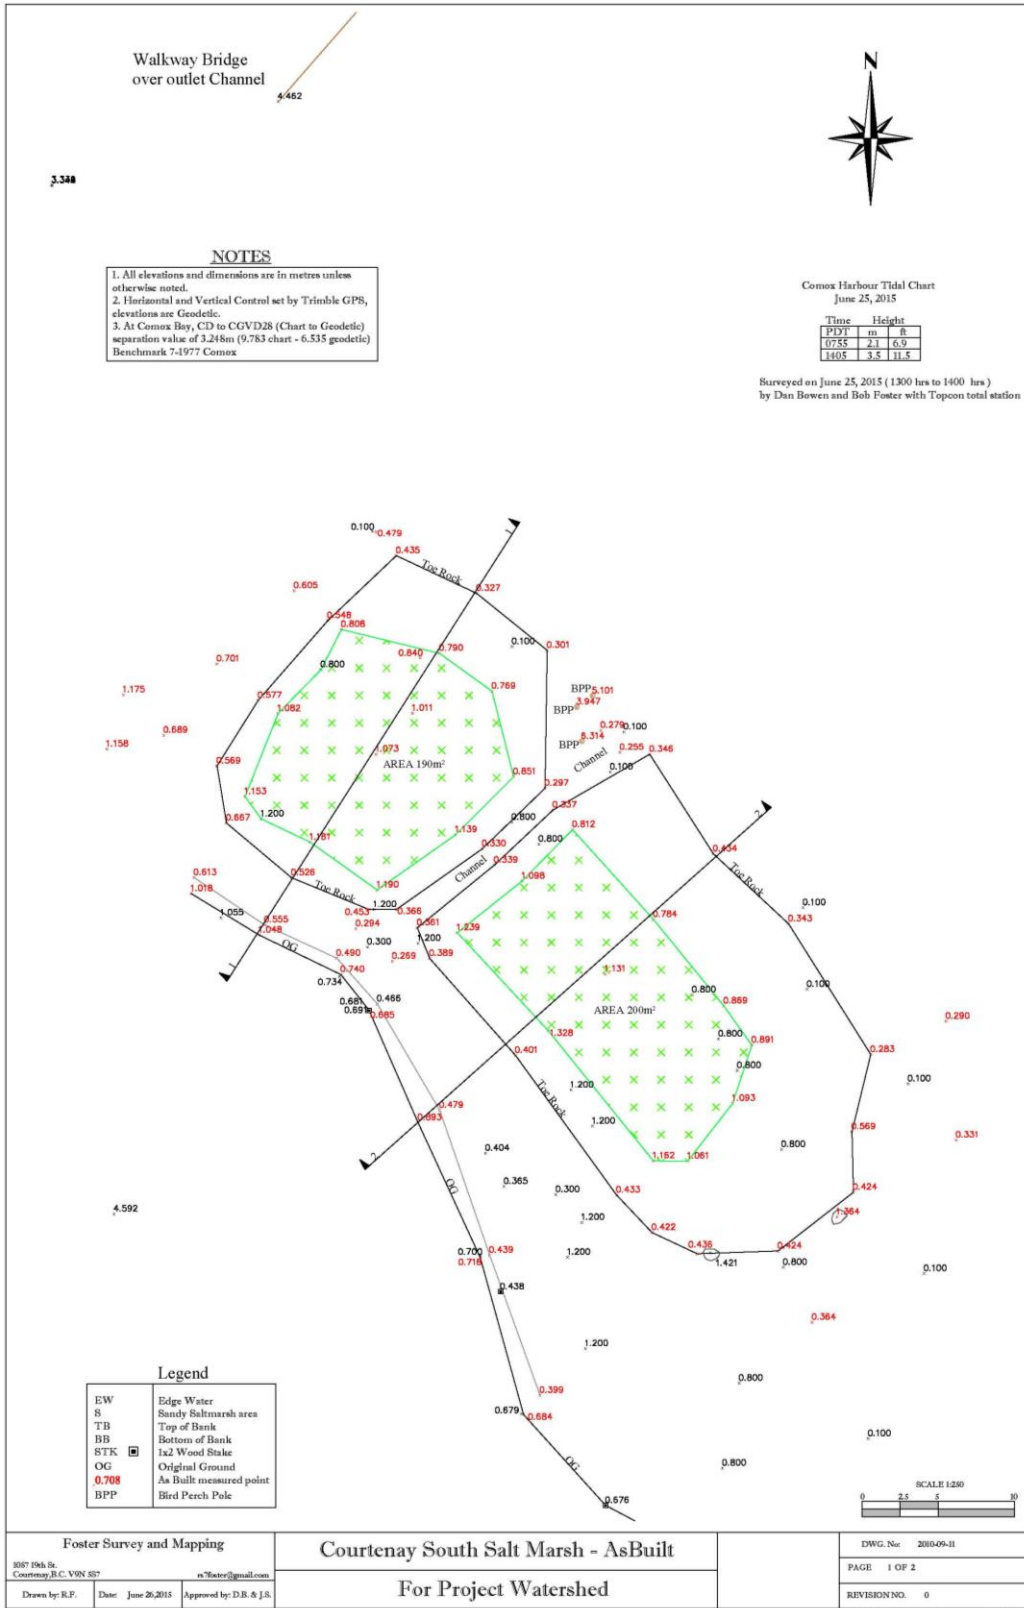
Engineering sketch of saltmarsh islands. Elevations are indicated.
